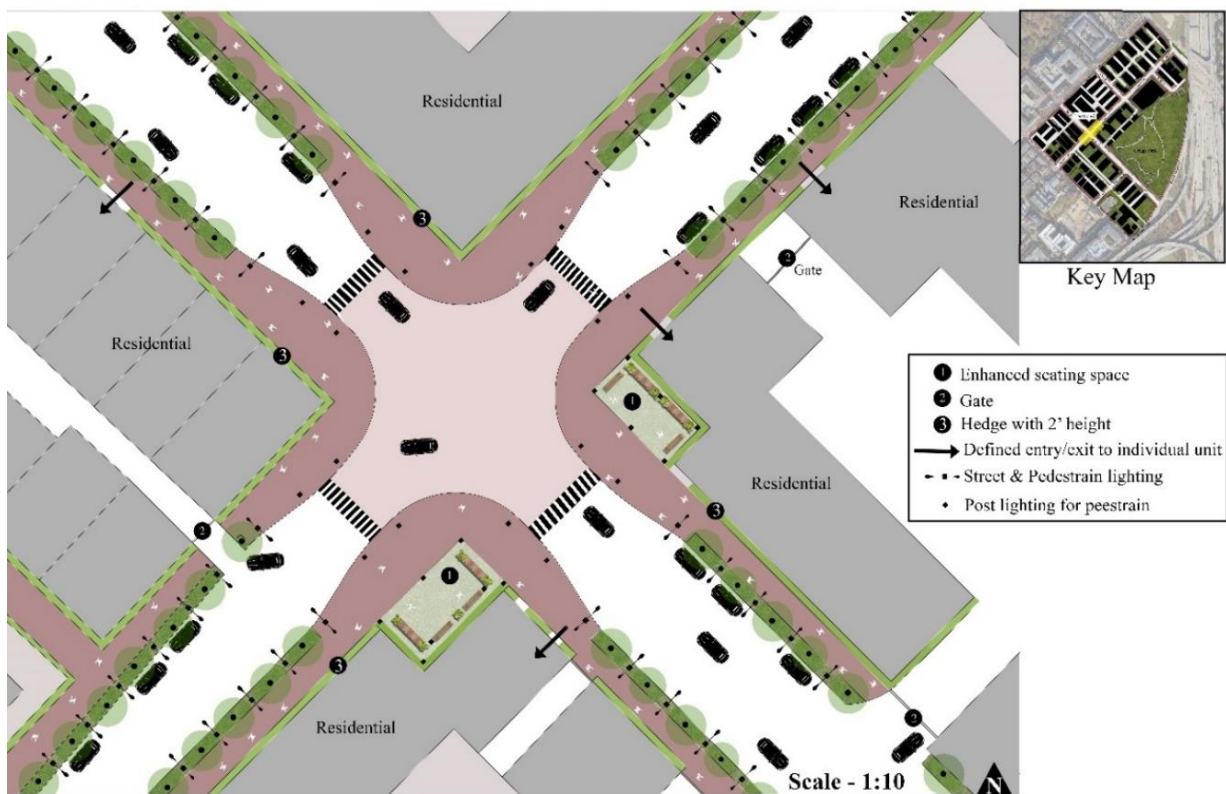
14 Plan for the Thomas Ave Clark Street intersection
